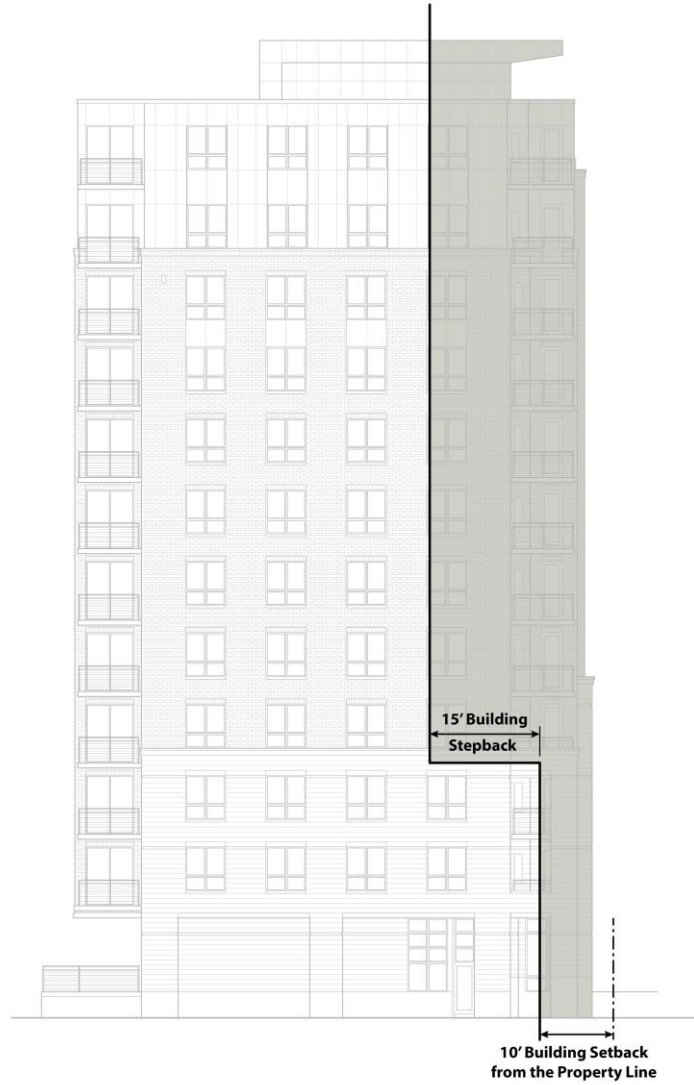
Elevations (Areas Inconsistent with Plan Are Shaded)
